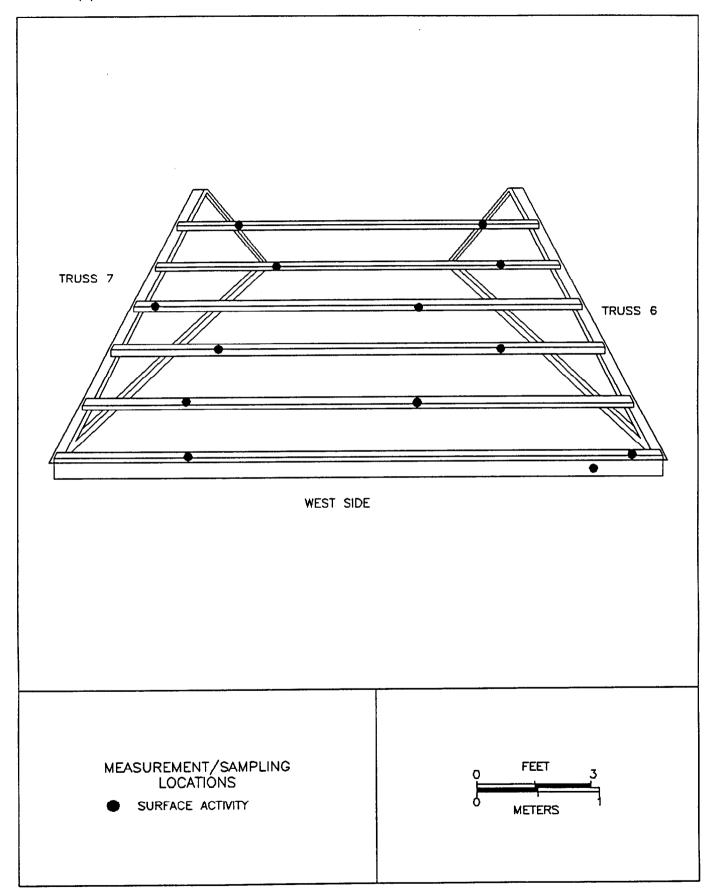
Building 3, Bay 6, West — Measurement and Sampling Locations
